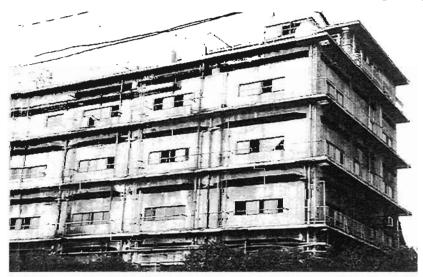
An undamaged clerestory windowed building on reclaimed land near the coastal highway
